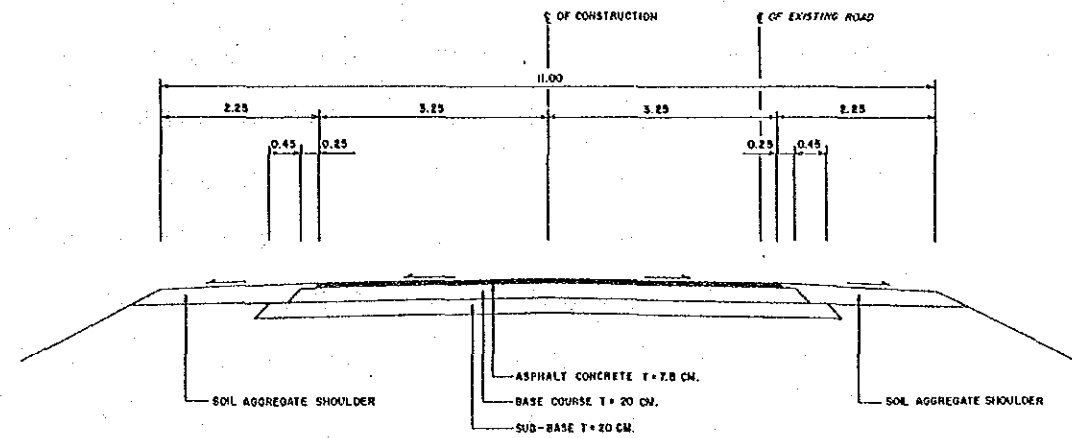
FIGURE TYPICAL PAVEMENT STRUCTURE FOR FLEXIBLE PAVEMENT IM-II
